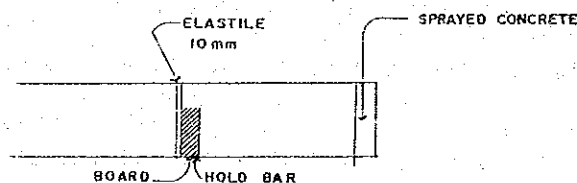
CONSTRUCTION JOINT OF CONCRETE SPRAYING
